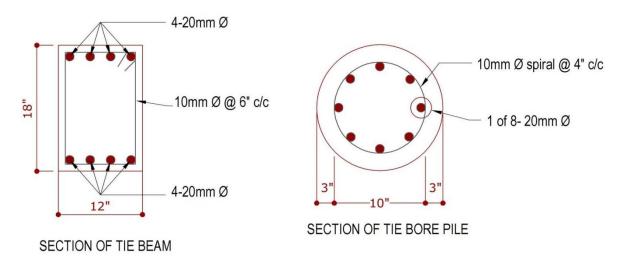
Cross Section of Bore Pile and Tie Beam showing reinforcement
